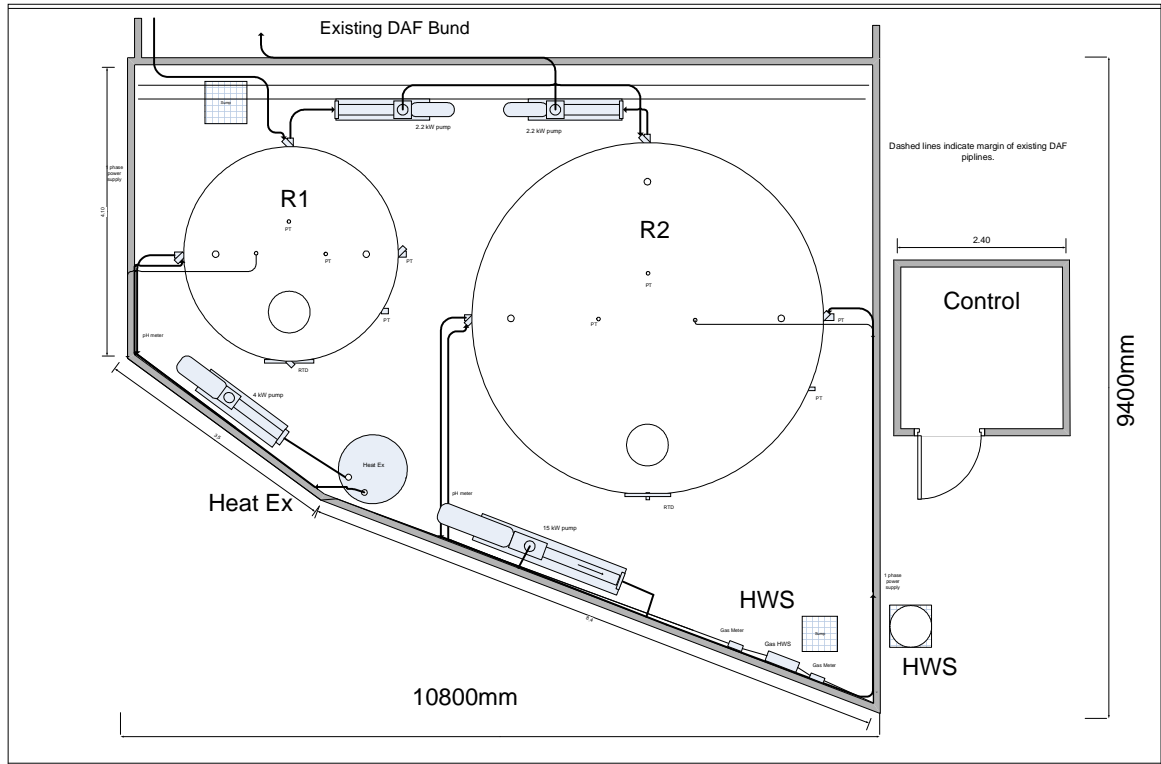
TPAD demonstration Plant Layout and Footprint excluding feed tank.
